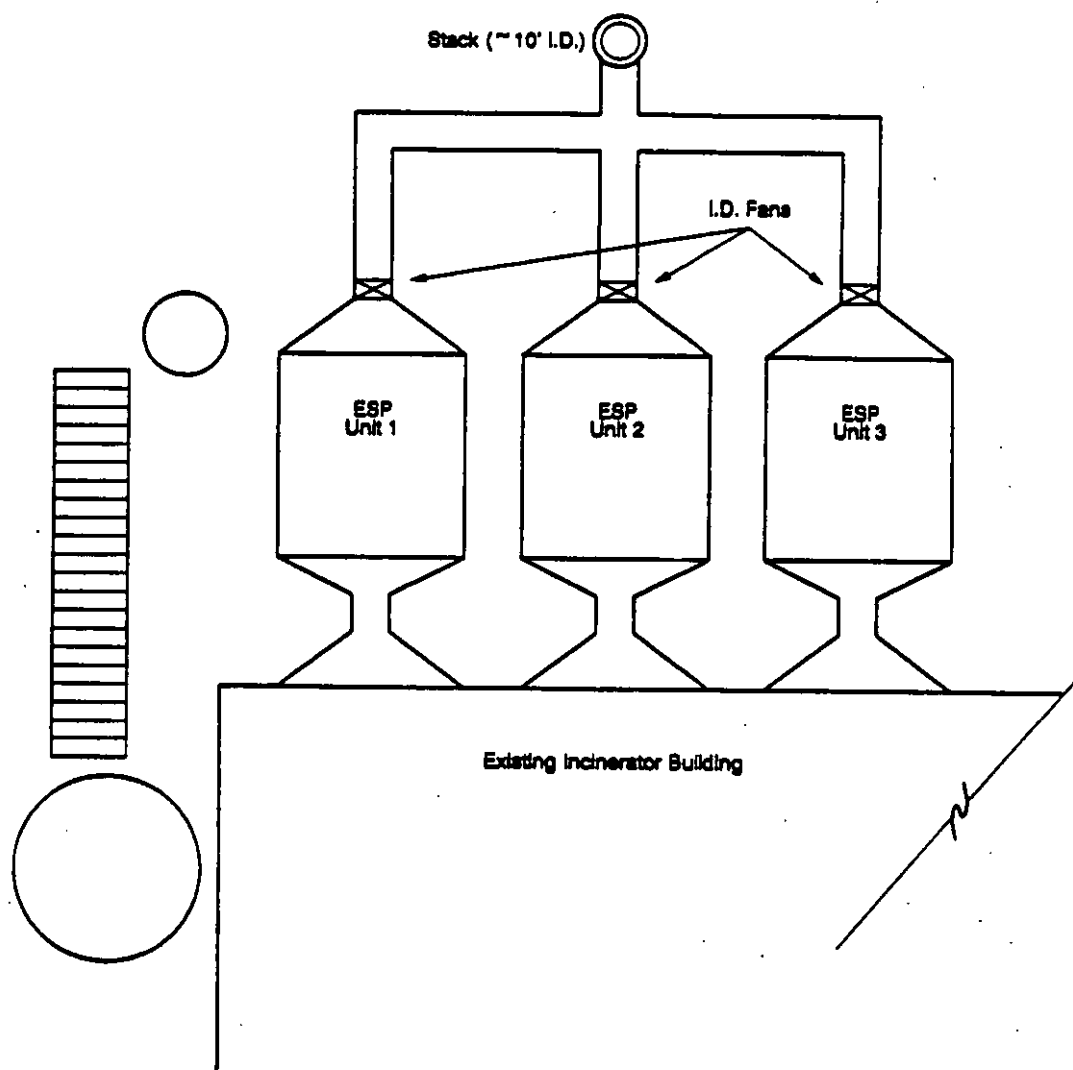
Plot Plan of Particulate Control Equipment
